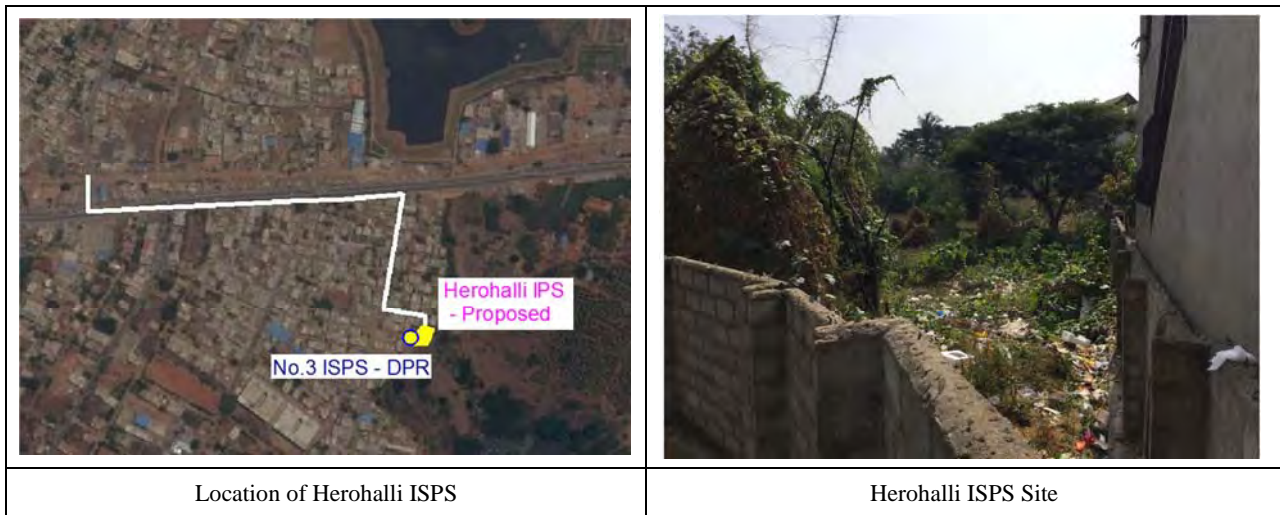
Location of Herohalli ISPS Site and Alignment of Main Sewer Line
